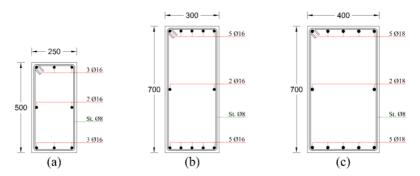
Lower story columns: a) 3-story column, b) 7-story column, c) 7-story column (units in mm)
